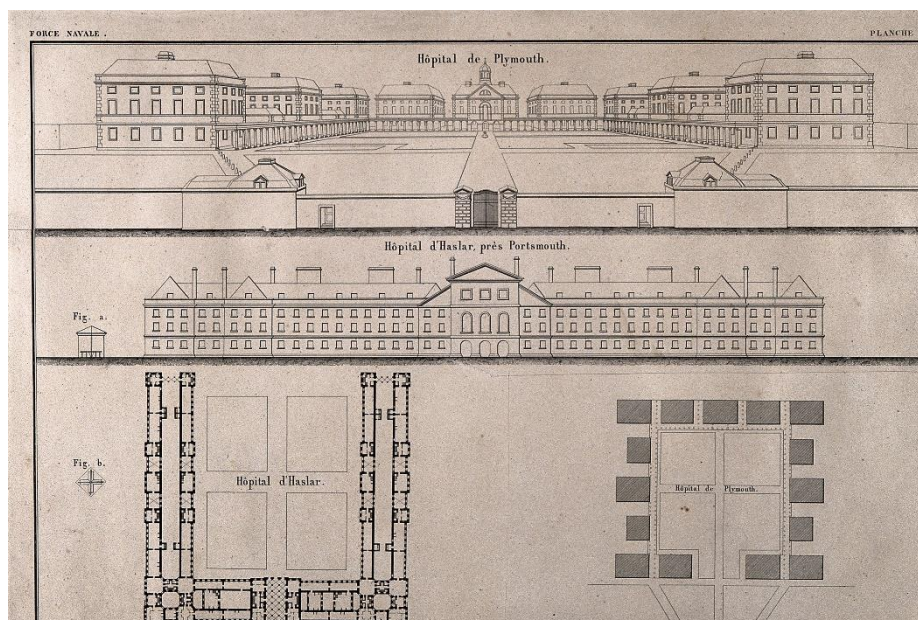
Naval Hospital at Plymouth, Facades and Plans
